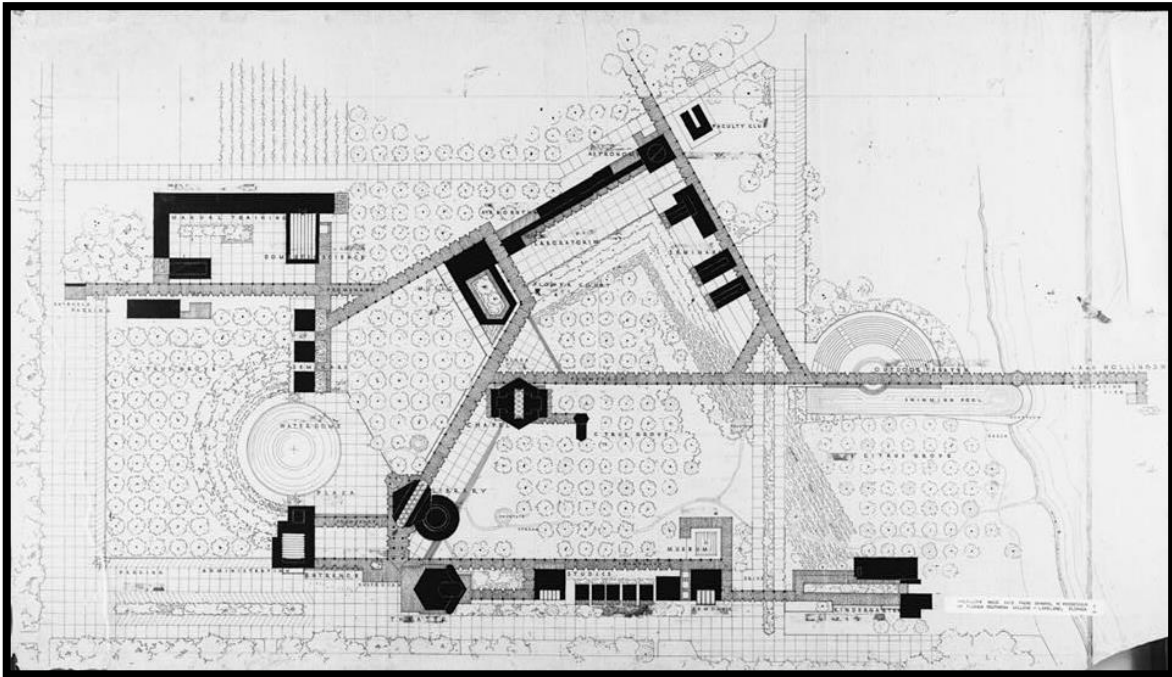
Original Master Plan of Florida Southern College, 1938. *Florida Southern College.
